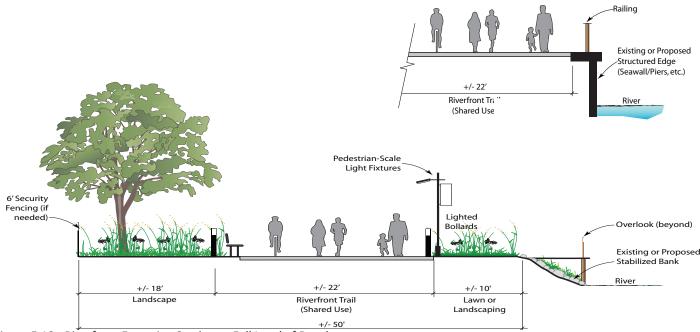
Riverfront Extension Section at Full Level of Development
